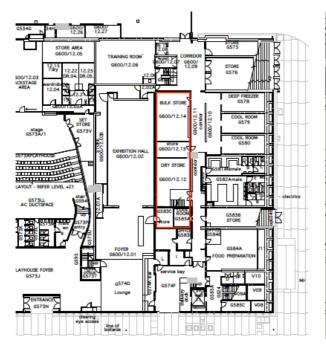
Excerpt from 2002 plan showing the current arrangement of Back-of-House store prior to the construction of the Bennelong Passage.
